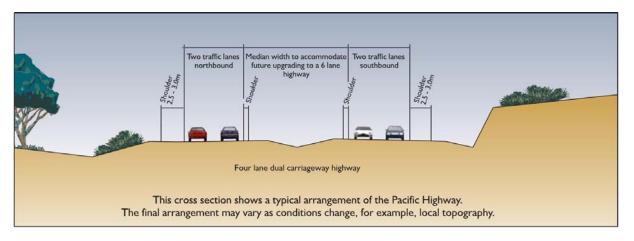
Typical cross section of an arterial standard road (Class A) (indicative only)
